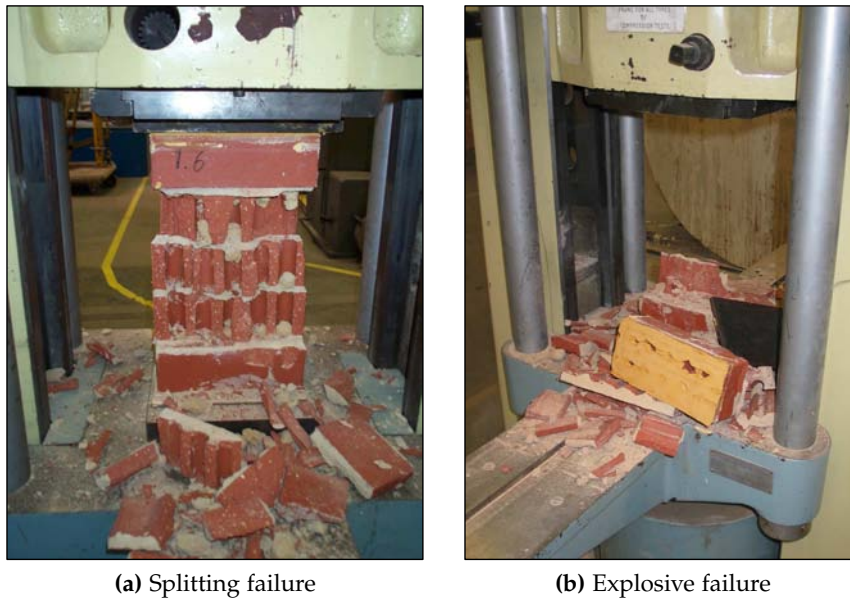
Typical compressive failure of perforated full-sized brick specimens.
